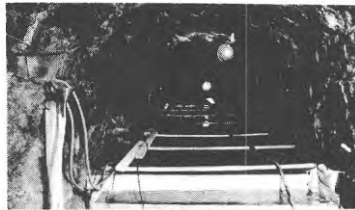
View of test tunnel showing dams arranged for measuring infiltration. The pumps and their control electrodes were placed near the bridge between dam A and dam B.
